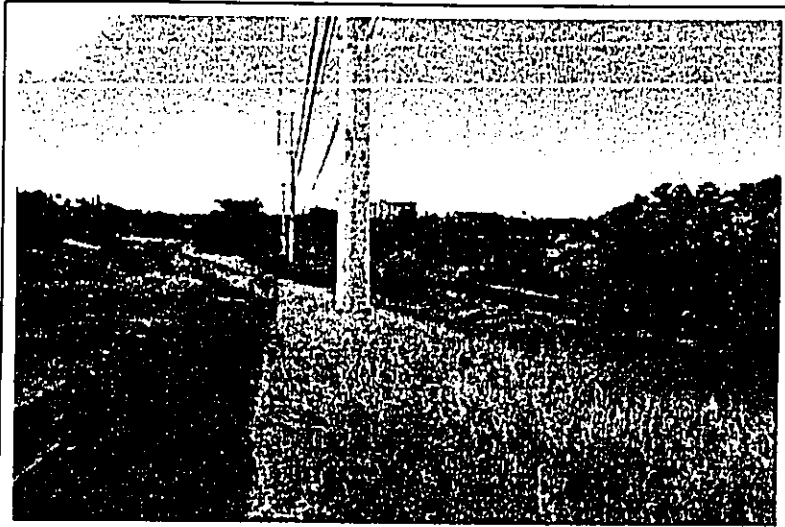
Looking south. Paved road & power poles running within project site. Honoapiilani Highway on the right.
